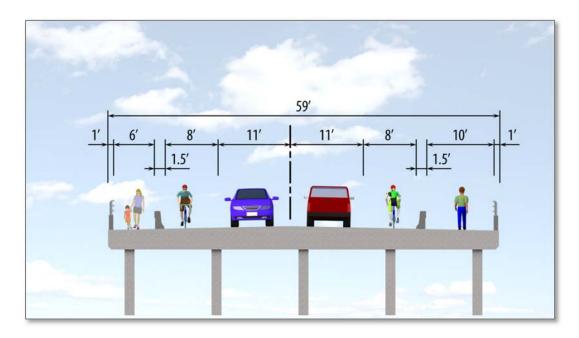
BUILD ALTERNATIVE 1 - BRIDGE TYPICAL SECTION
